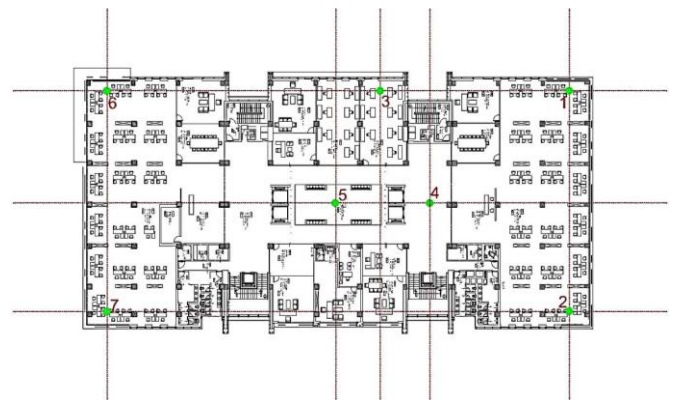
Measurement locations determined by axes created on the third-floor plan (Trabzon Ortahisar Belediyesi, 2022)
